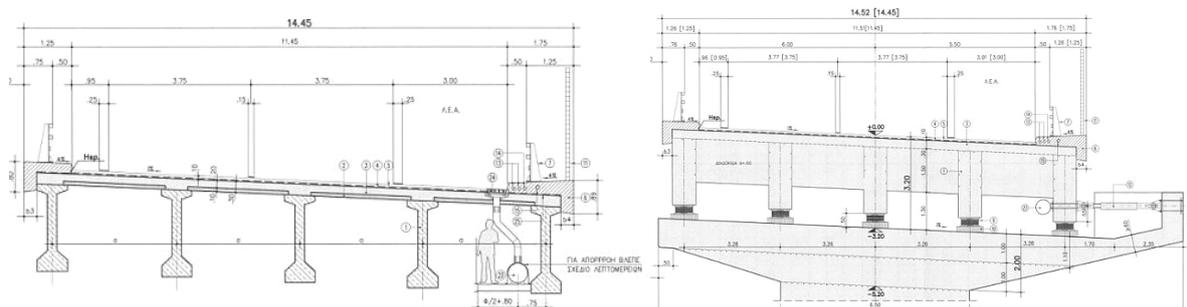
Typical deck cross-section at the span (left) and above the piers (right).
